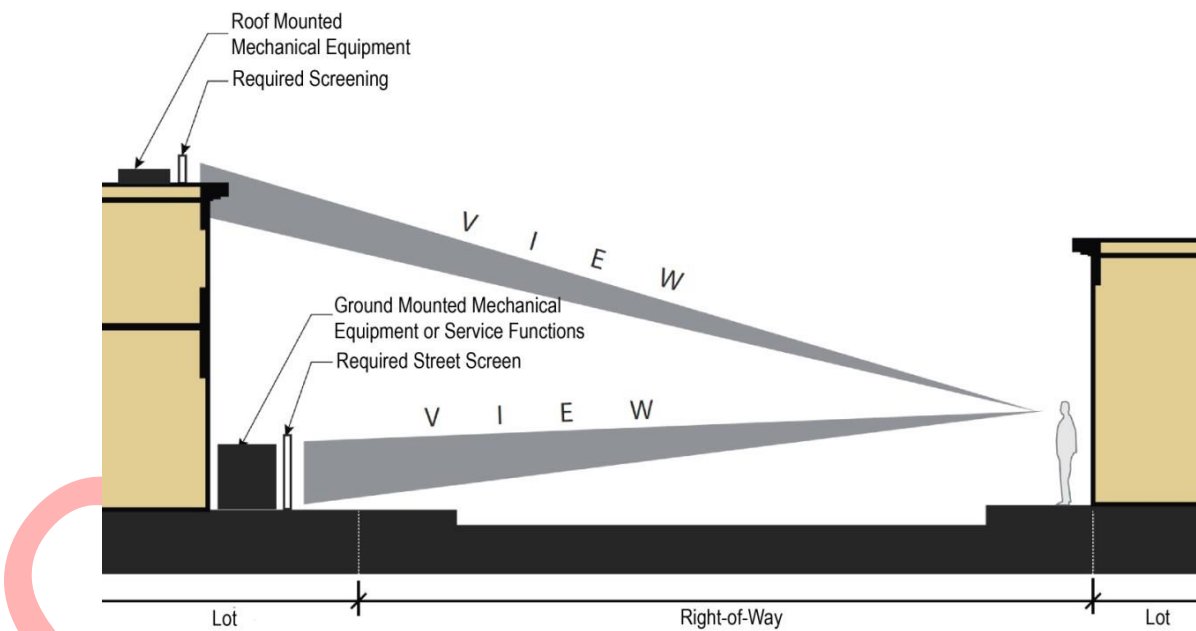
Illustration showing required screening of roof and ground mounted equipment.
